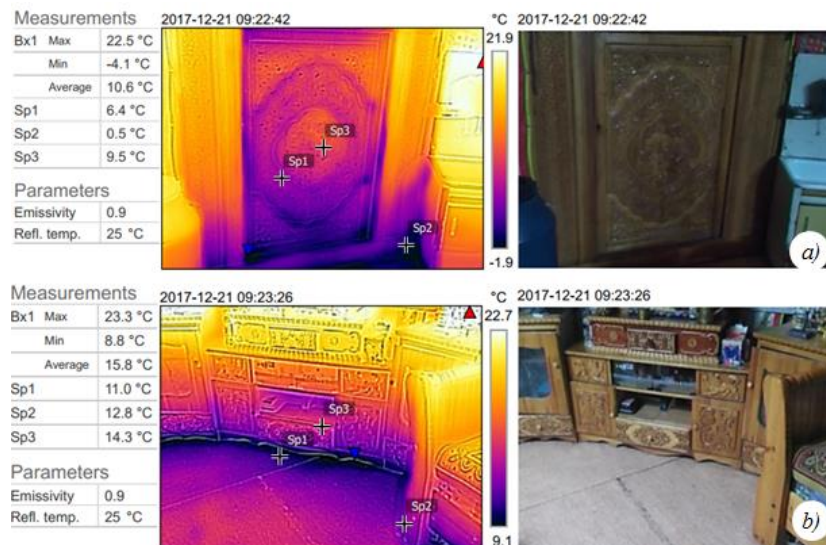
Inside thermal photo of the yurt, a) Door, b) North side wall
